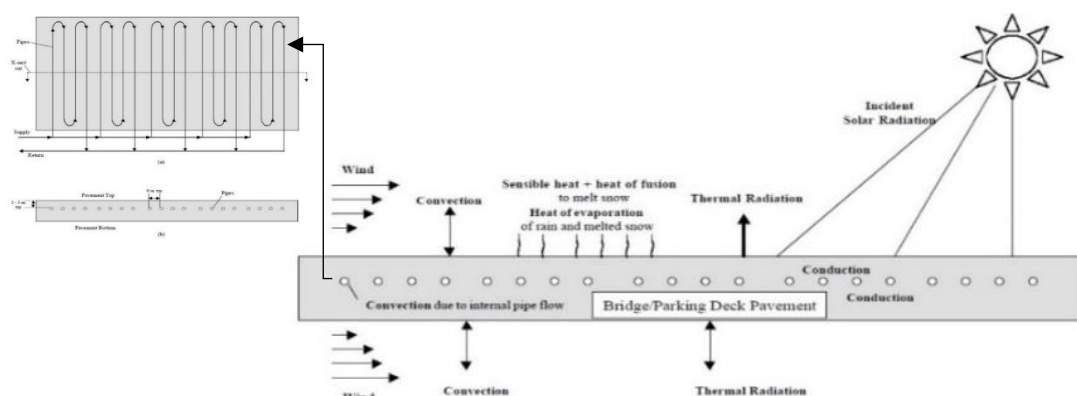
Example of the system prototype combined GHSP, bridge deck and ground soil thermal storage (a) plan view (b) cross section view (Chiasson & Spitler 2001)
